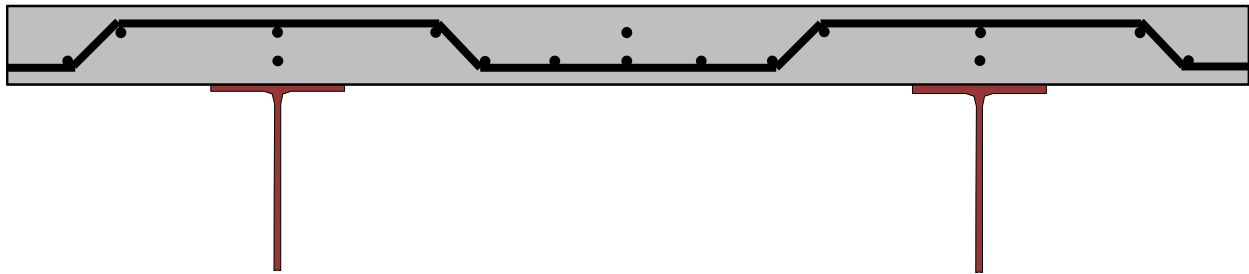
Typical Details of Deck Cross-Section Showing Bent Transverse Bars
